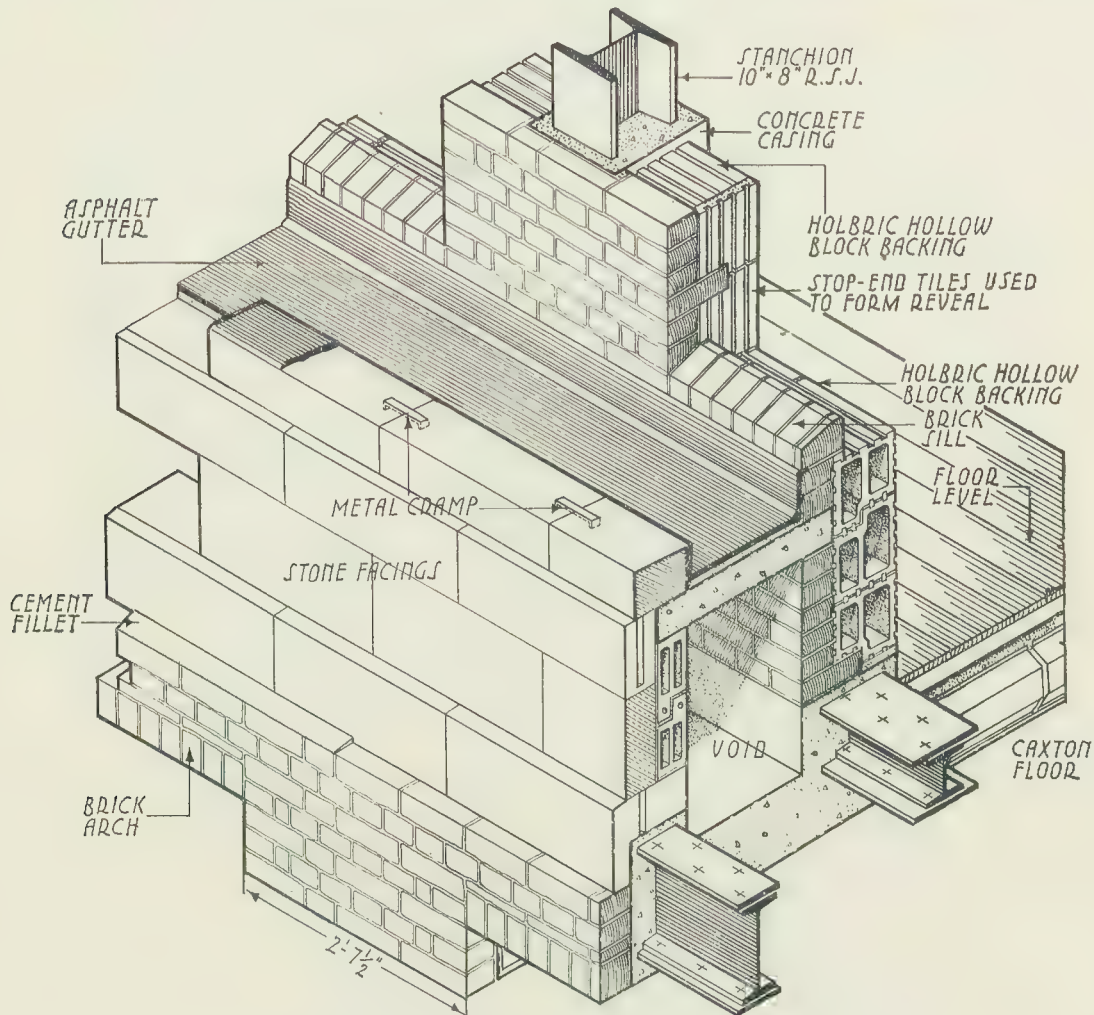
BRICK-FACED WALL BACKED WITH HOLLOW BLOCKS
